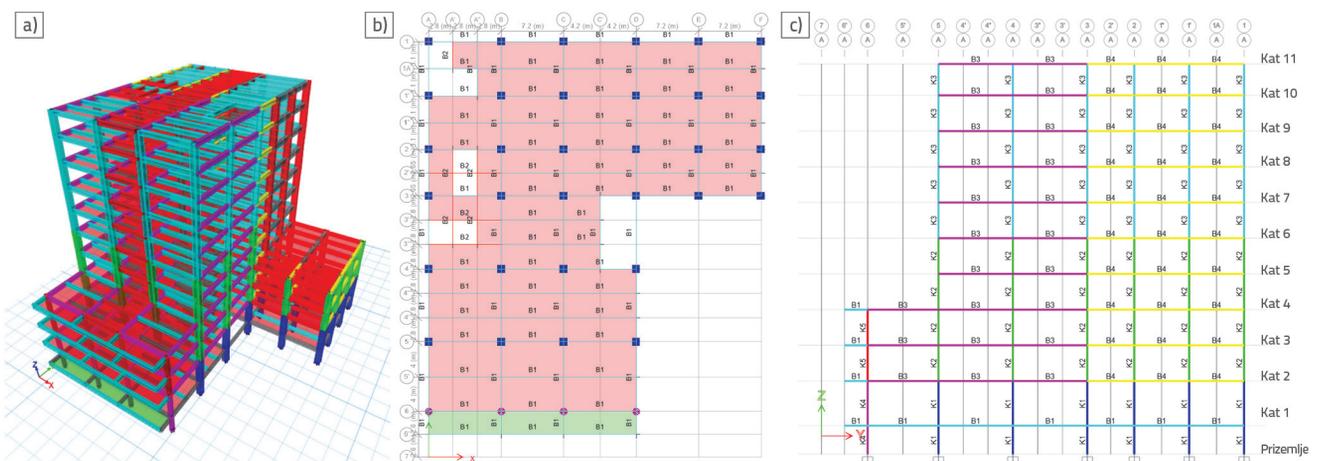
a) 3D view, b) plan view, c) cross-section view of the building model
